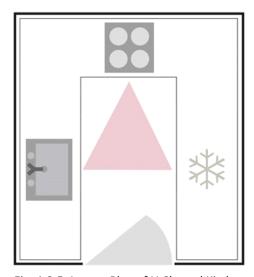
Layout Plan of U-Shaped Kitchen
